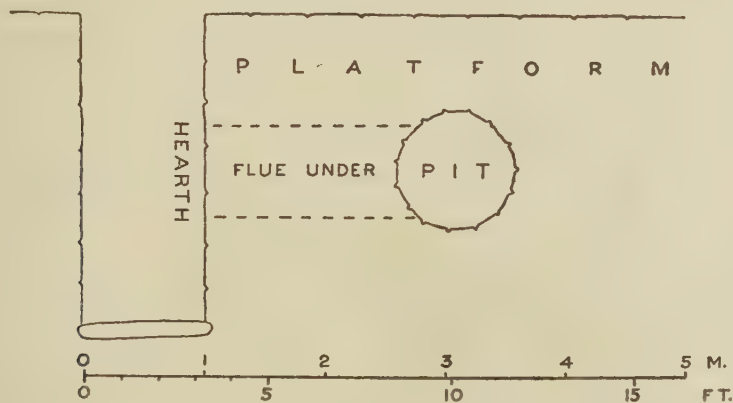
SKETCH PLAN OF KILN SET IN STONE-BUILT PLATFORM,
